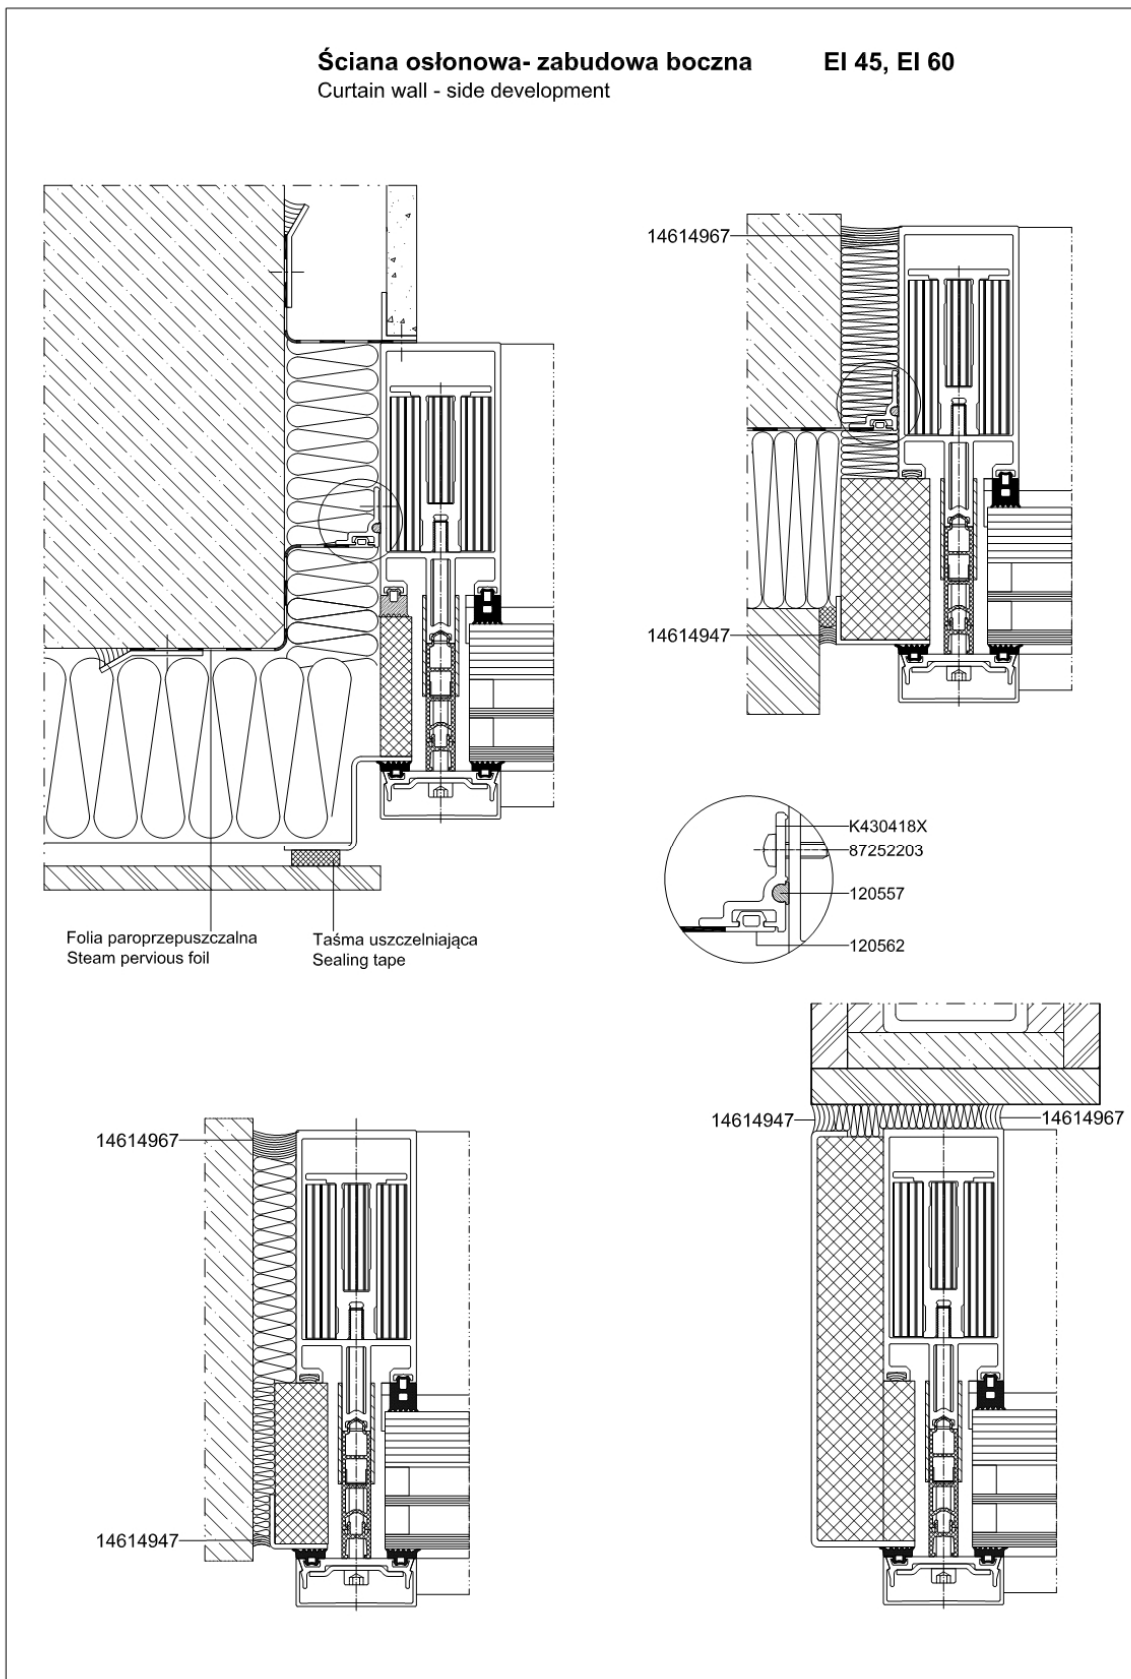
MB-SR50N EI EI60 system curtain wall side fixing solutions
